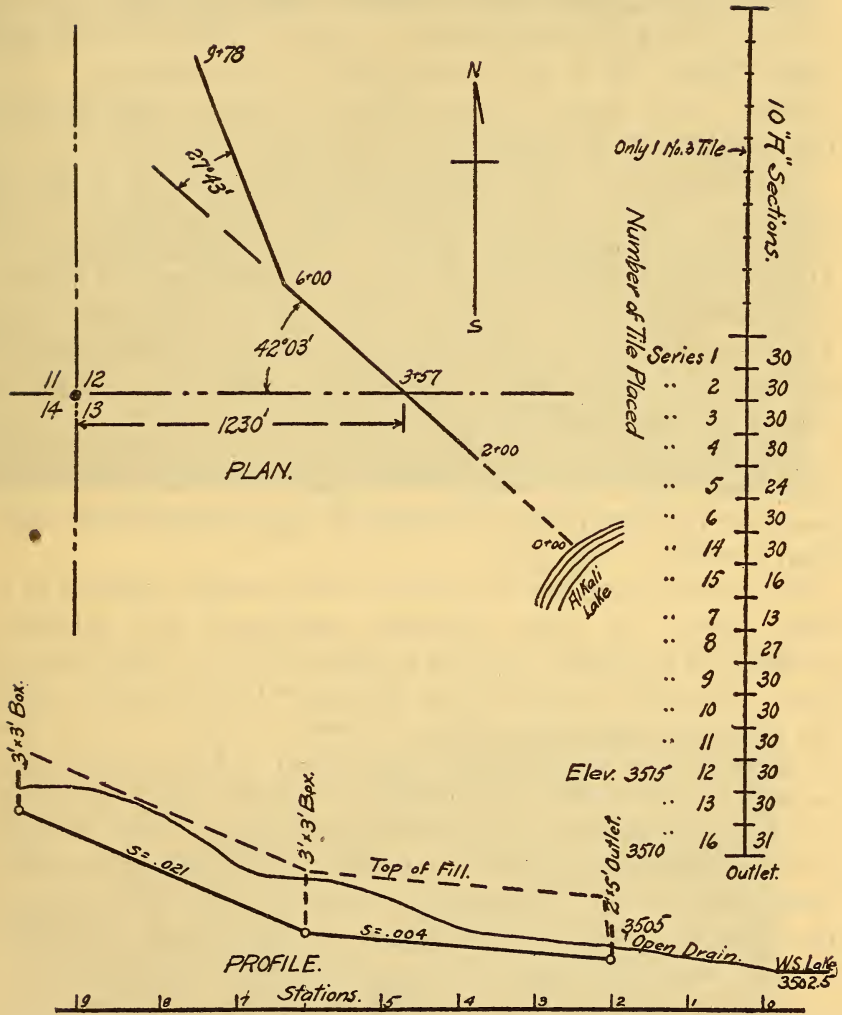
Showing location, plan, profile, and arrangement of experimental drain tile at Fort Shaw, Mont.
